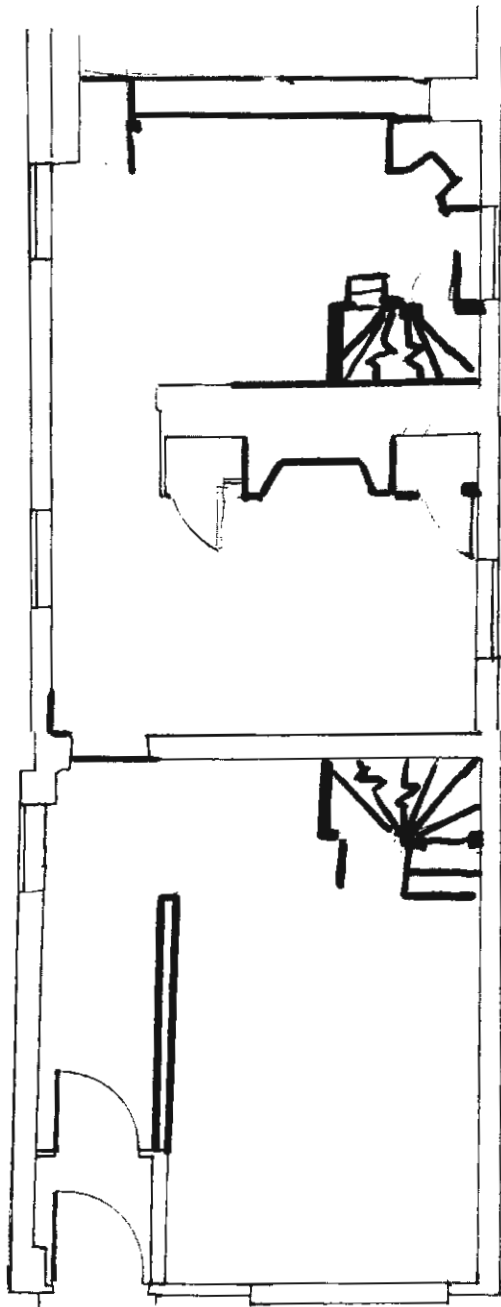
First period floor plan. Changes from current indicated by thick lines. Front room had winder stair and wall creating hallway. Middle room had fireplace. Rear (kitchen) had corner fireplace and winder stair.
